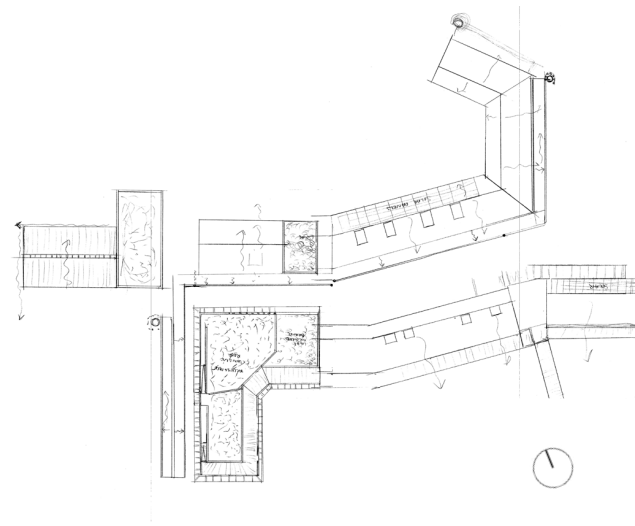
Sketch plan Roof level at 1:200 (Author 2021)
